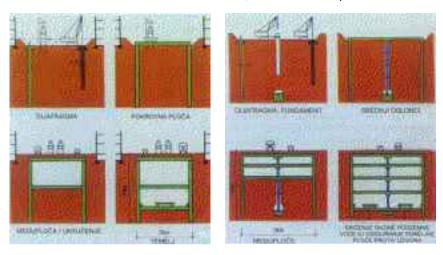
Construction of metro stations by Top-Down method (case of Munich subway): construction of diaphragm with roof slab (left) and with roof slab and central column (right).
